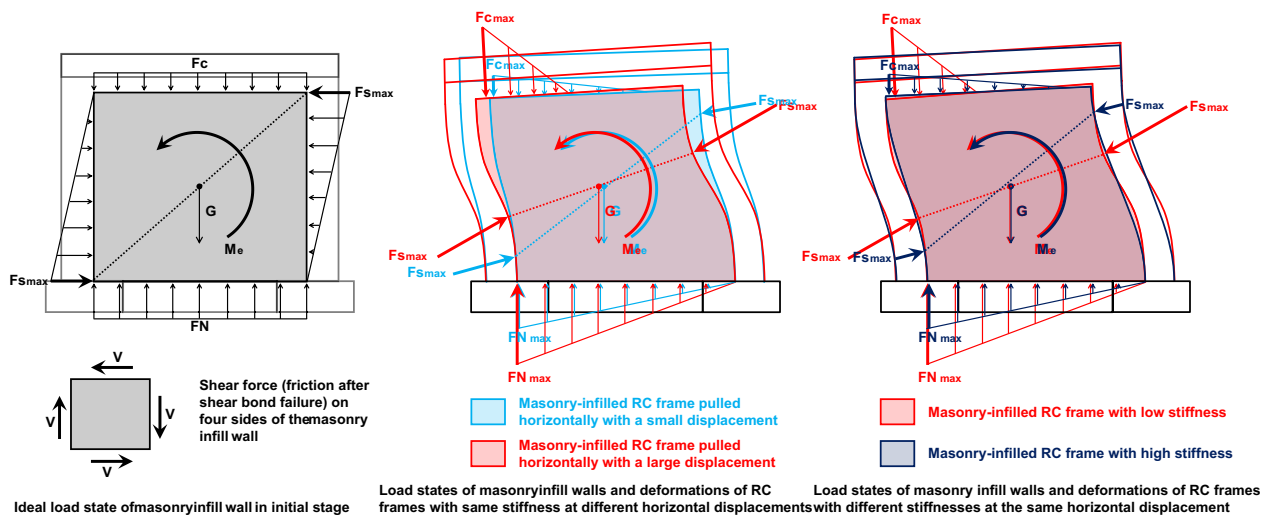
Load state of masonry infill wall changed by deformation of RC frame
